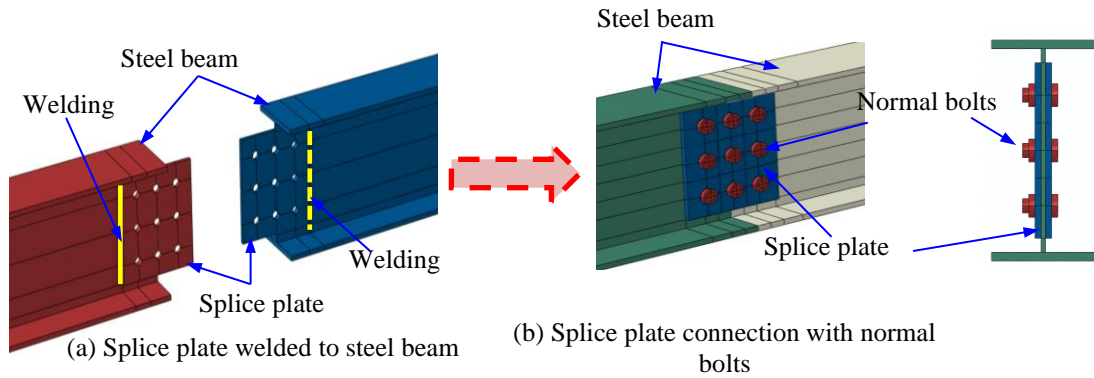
Details of proposed beam-to-beam connections with splice plates and normal bolts
